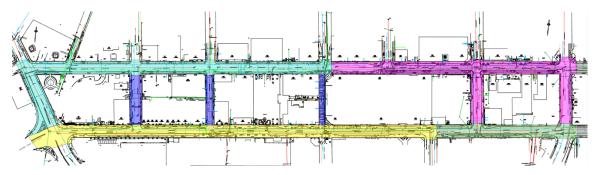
Phase 1 Proposed Construction Plan (Years 1-5)
